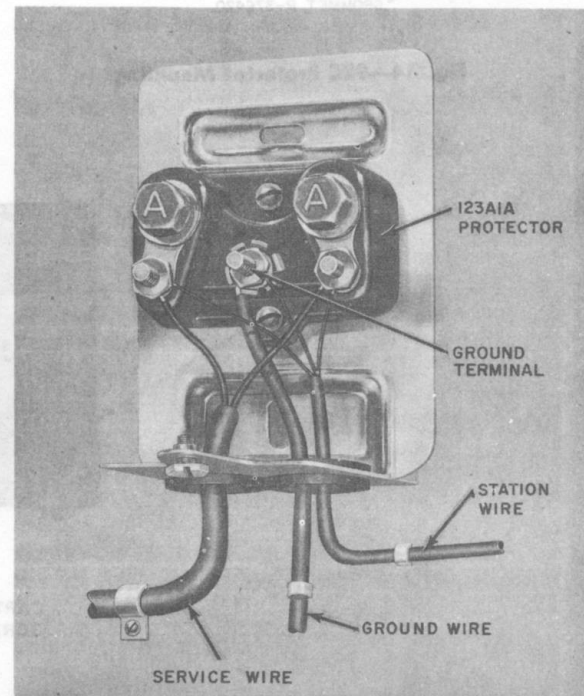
123A1A Protector Installed in 305A2 Protector Mounting
